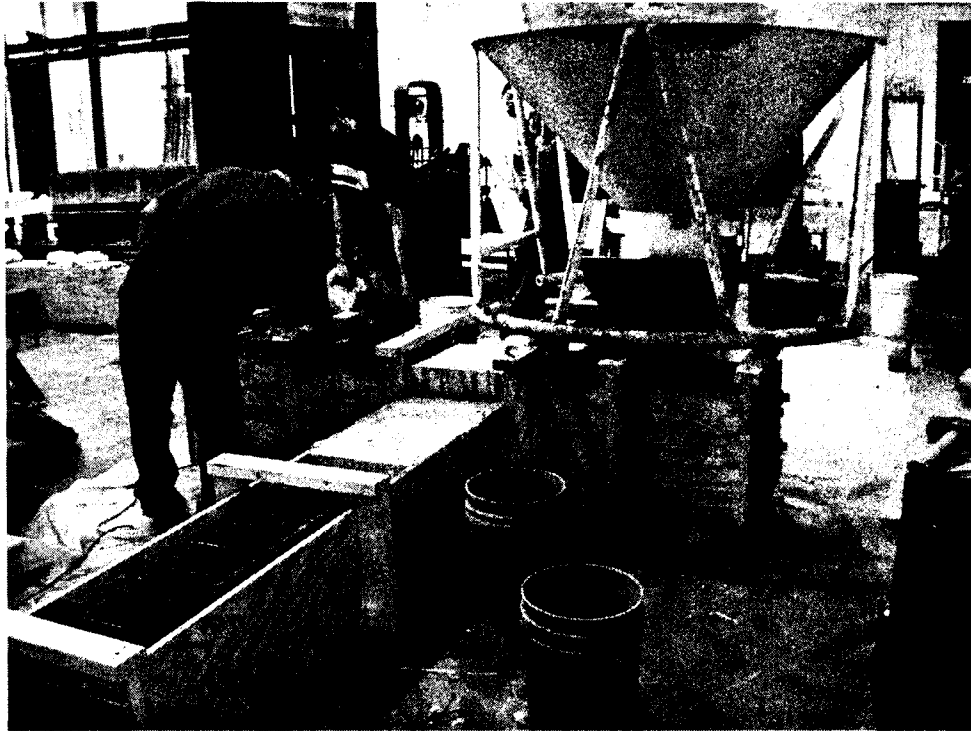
Casting of the ready-mix concrete portion of the beam-column specimen
